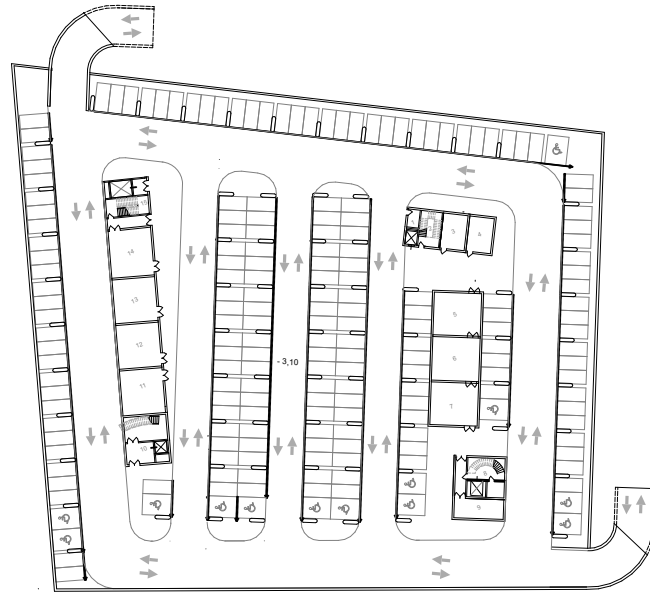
Floor plans: Underground floor, 1:1250
